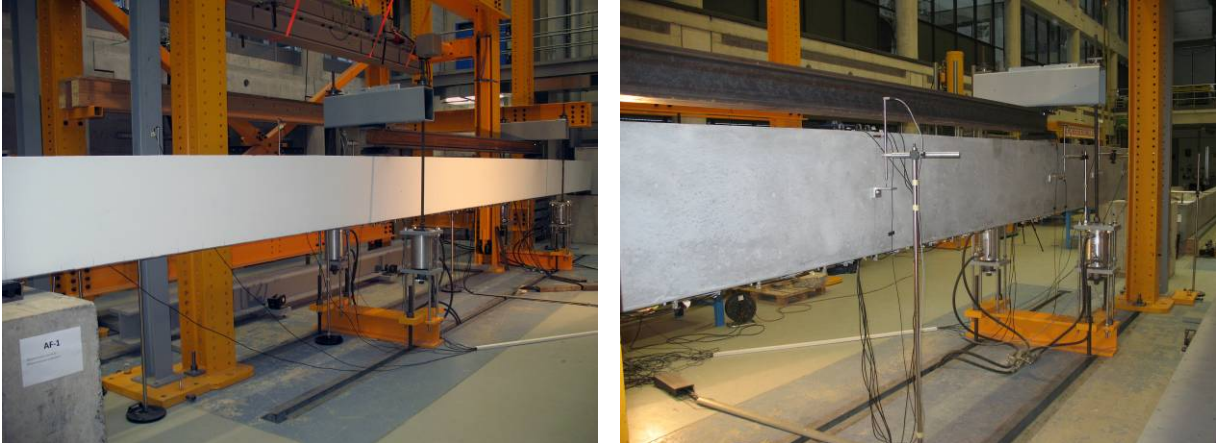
Views of the full scale beam setup and measurement arrangement
